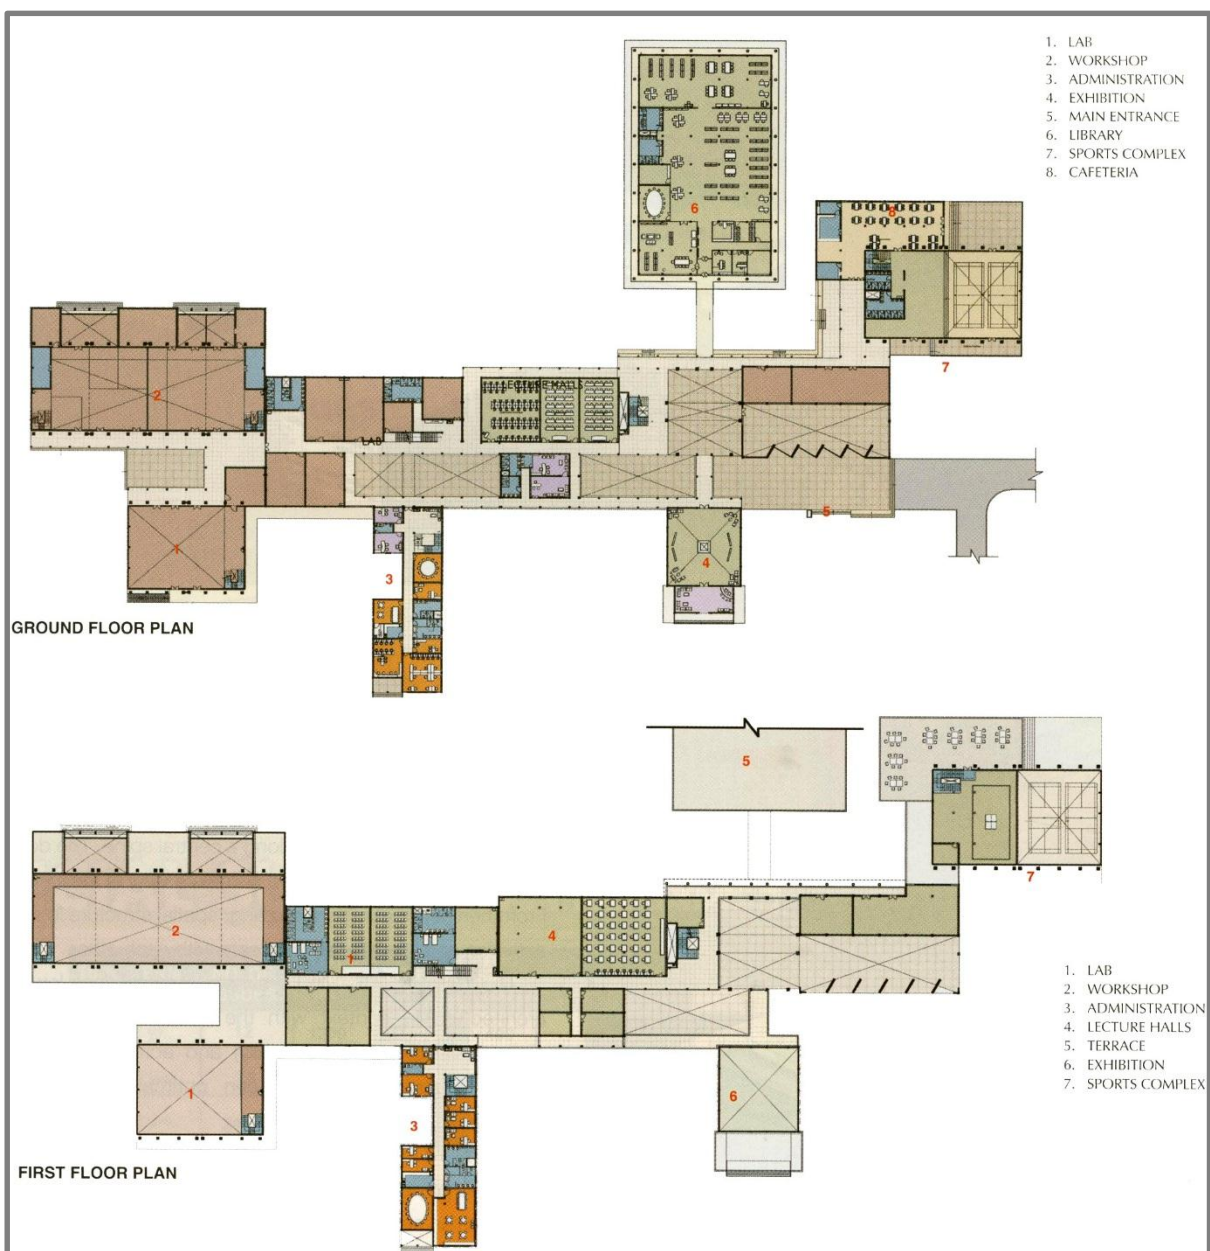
Floor plans illustrating the spatial arrangement and concept (Adapted from A Spatial Dialogue, 2010: 135).
